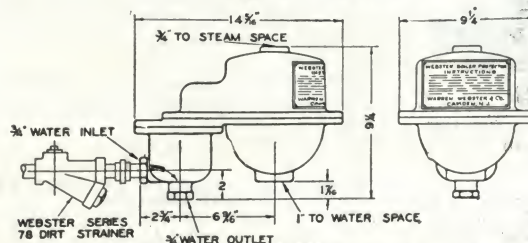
Roughing-in Dimensions of Webster Boiler Protector
